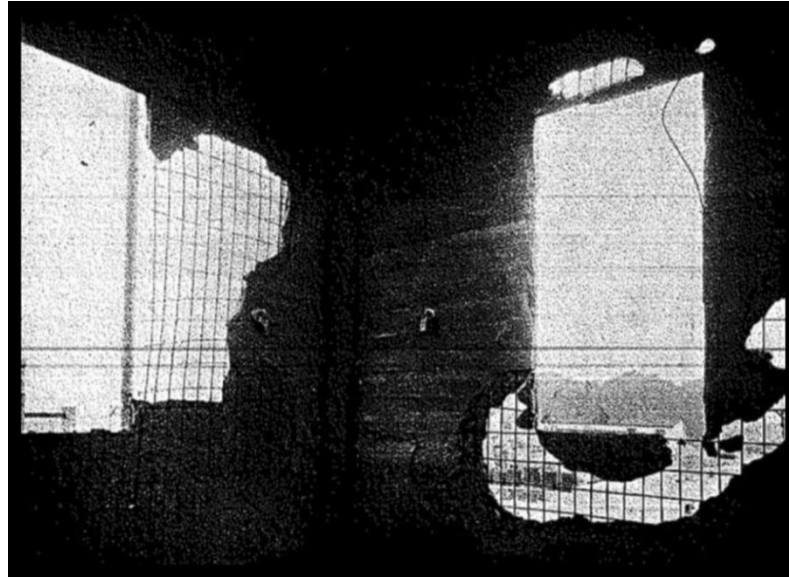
A view of Gary's test in 1916 (Gary 1916).
